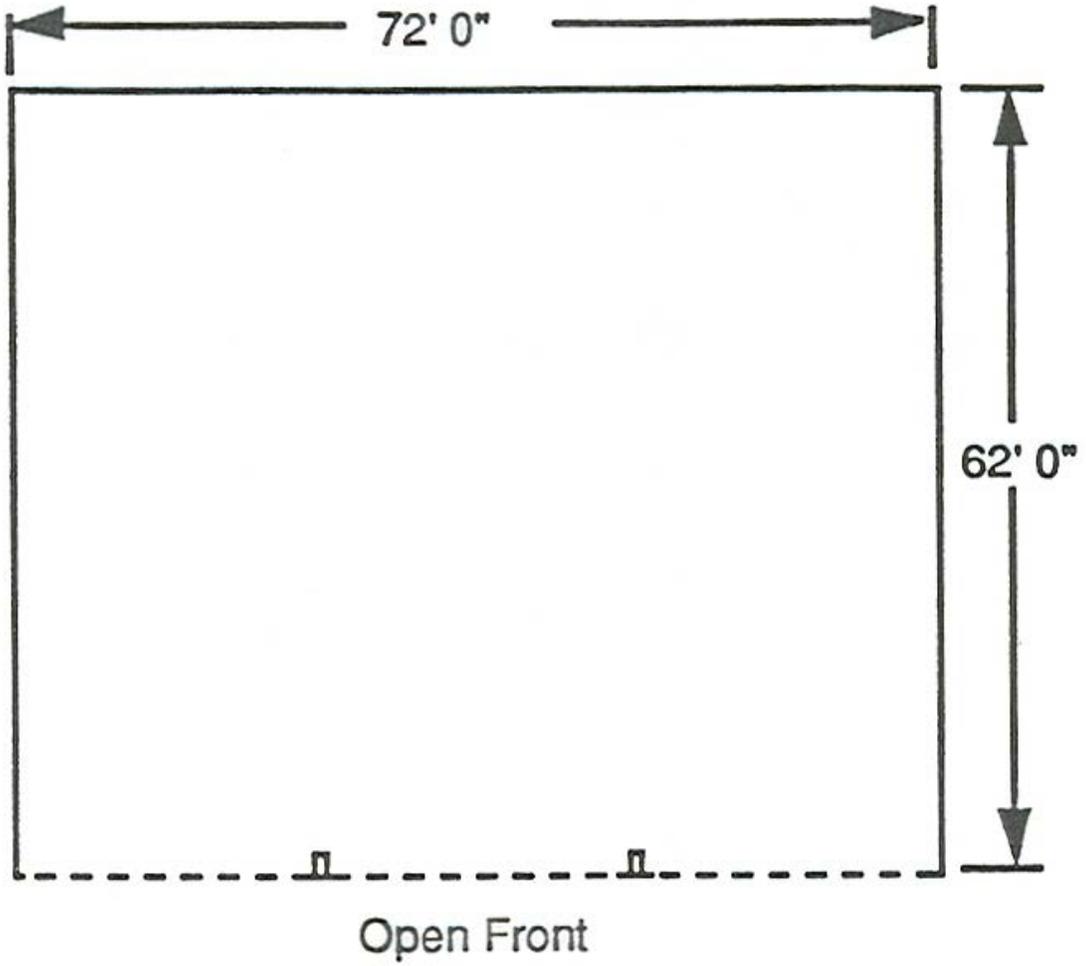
Vehicle Storage I (Building 7) Floor Plan
